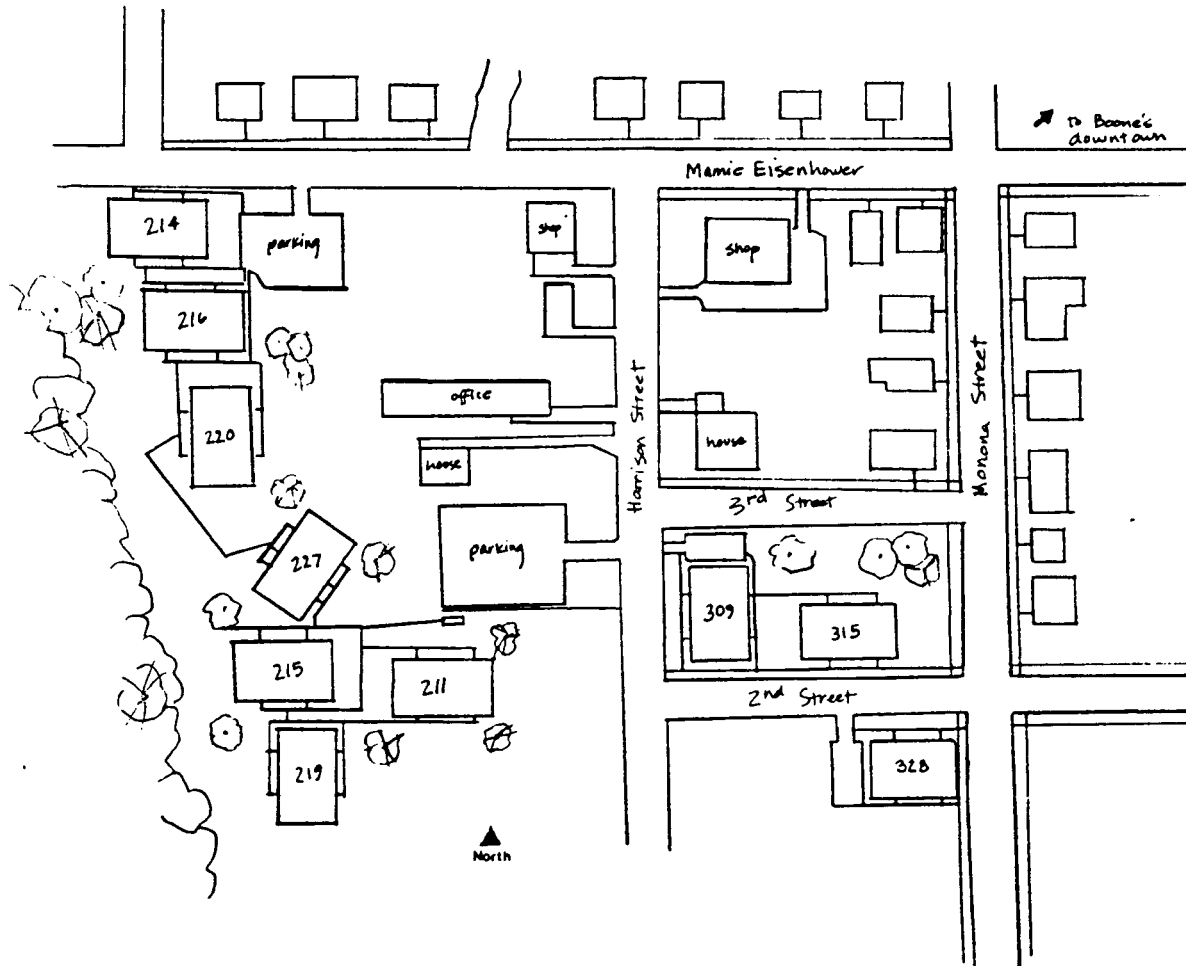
Midtown Village: Site Plan, Boone, Iowa
